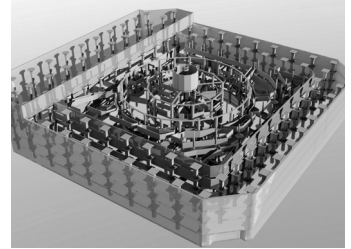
Overall image, showing concrete structure without floor elements (incomplete). Cornelius Reppe.
